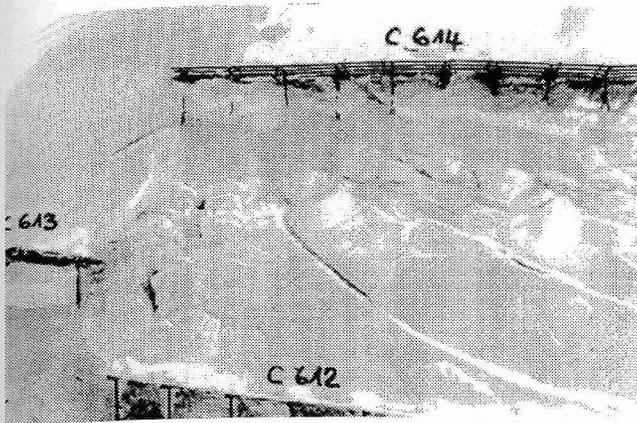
Hard slab stopped by steel bridges, Val Giandains-Pontresina
